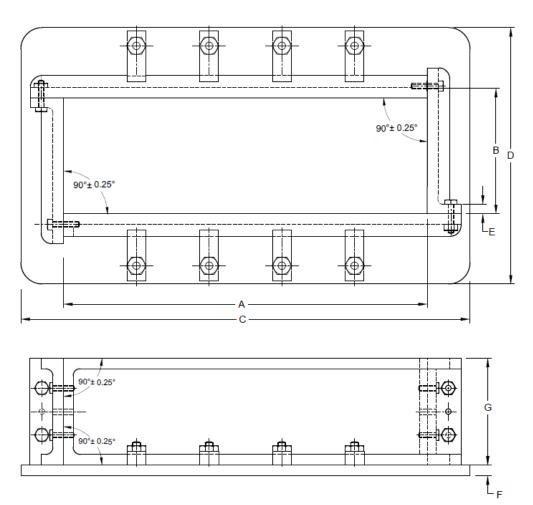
Typical Cast Iron/Mild Steel Beam Mould
